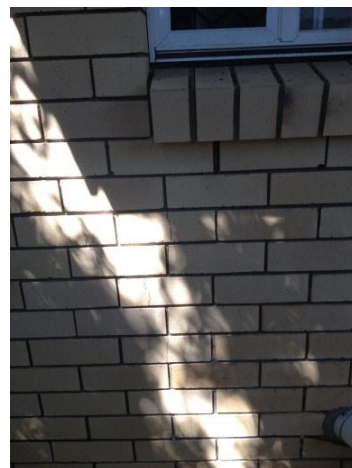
'Opening' cracking brickwork due to settlement.
